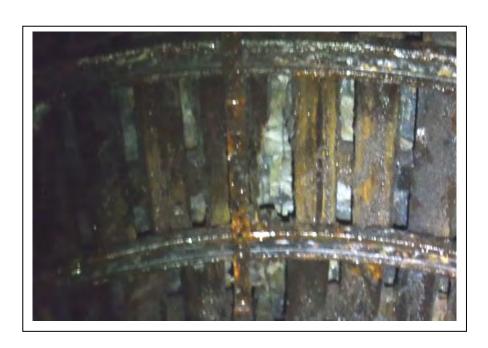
U/S sidewall at 65m Drainage flowing at full capacity
